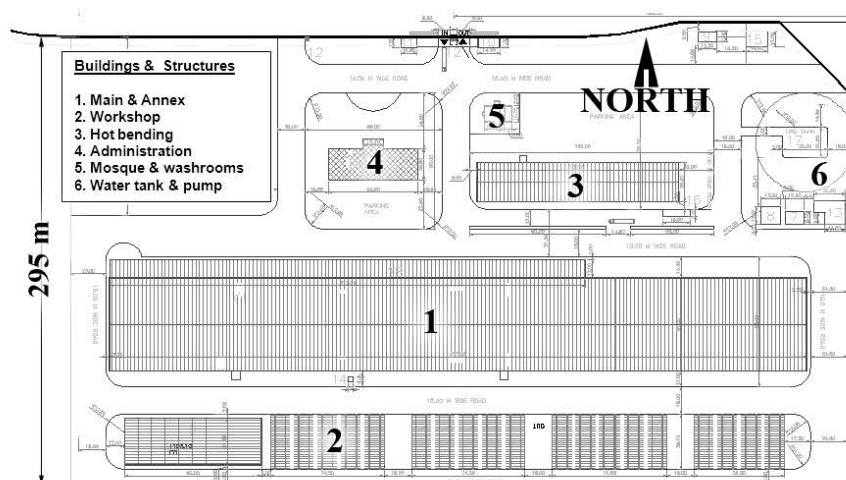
Layout of Al Jazira Steel Pipe Factory structures
